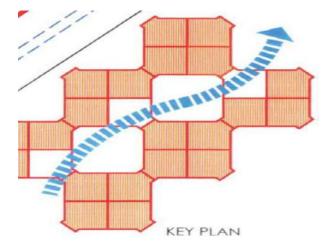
Low Carbon Building Construction in Delhi (Source: Anangpur Building Centre, 2013)
